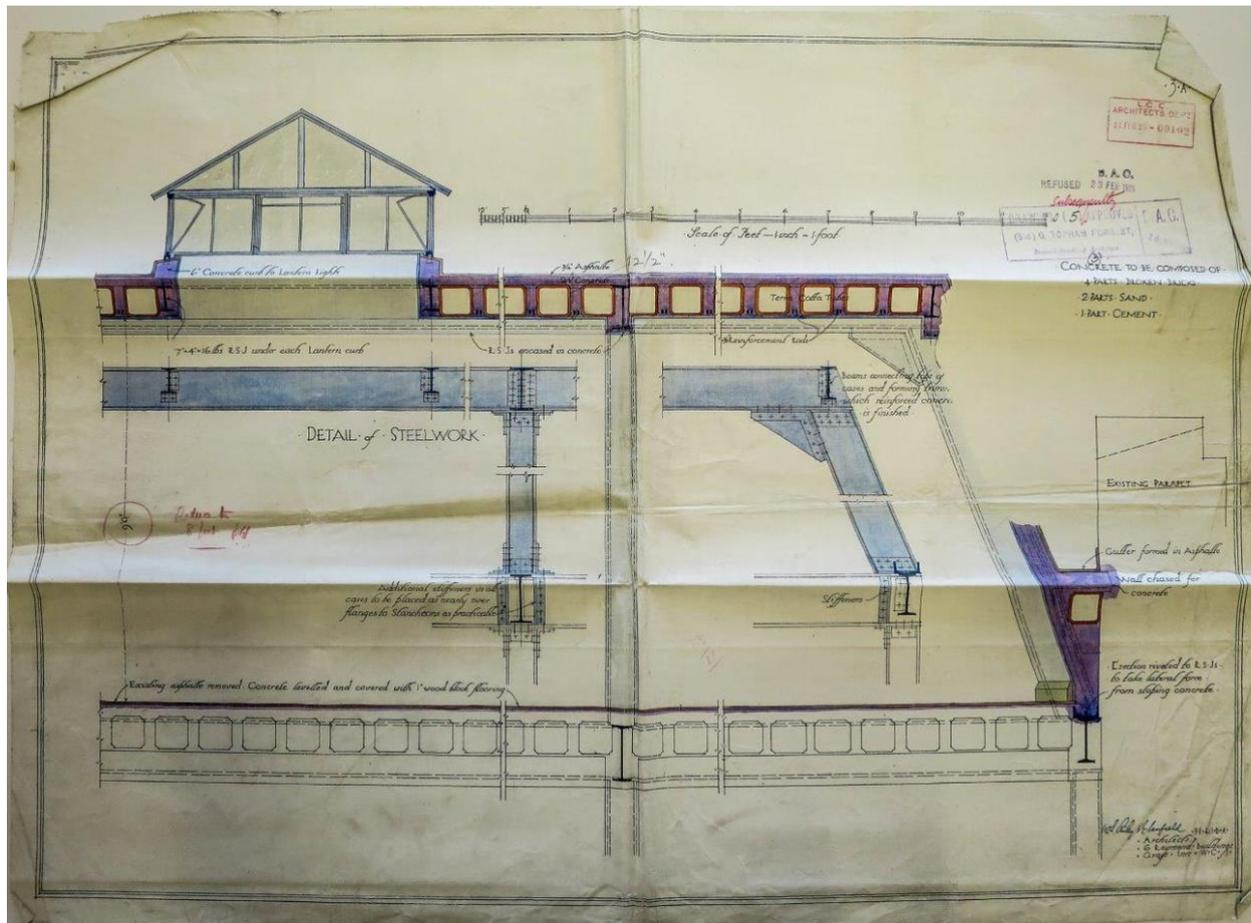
Addition of roof structure including metal entablature over existing parapet.
